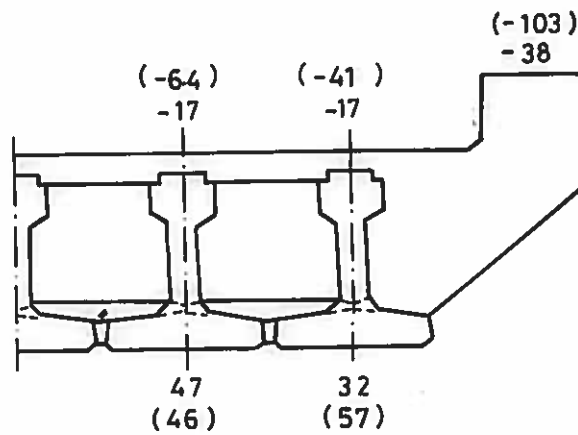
A50 Road Bridge (Pseudo-Box)
